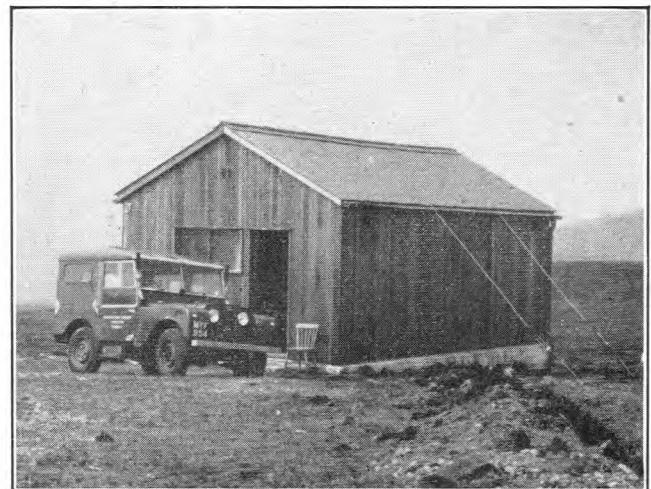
THE B1 TIMBER BUILDING ON BLACK MOUNTAIN.
